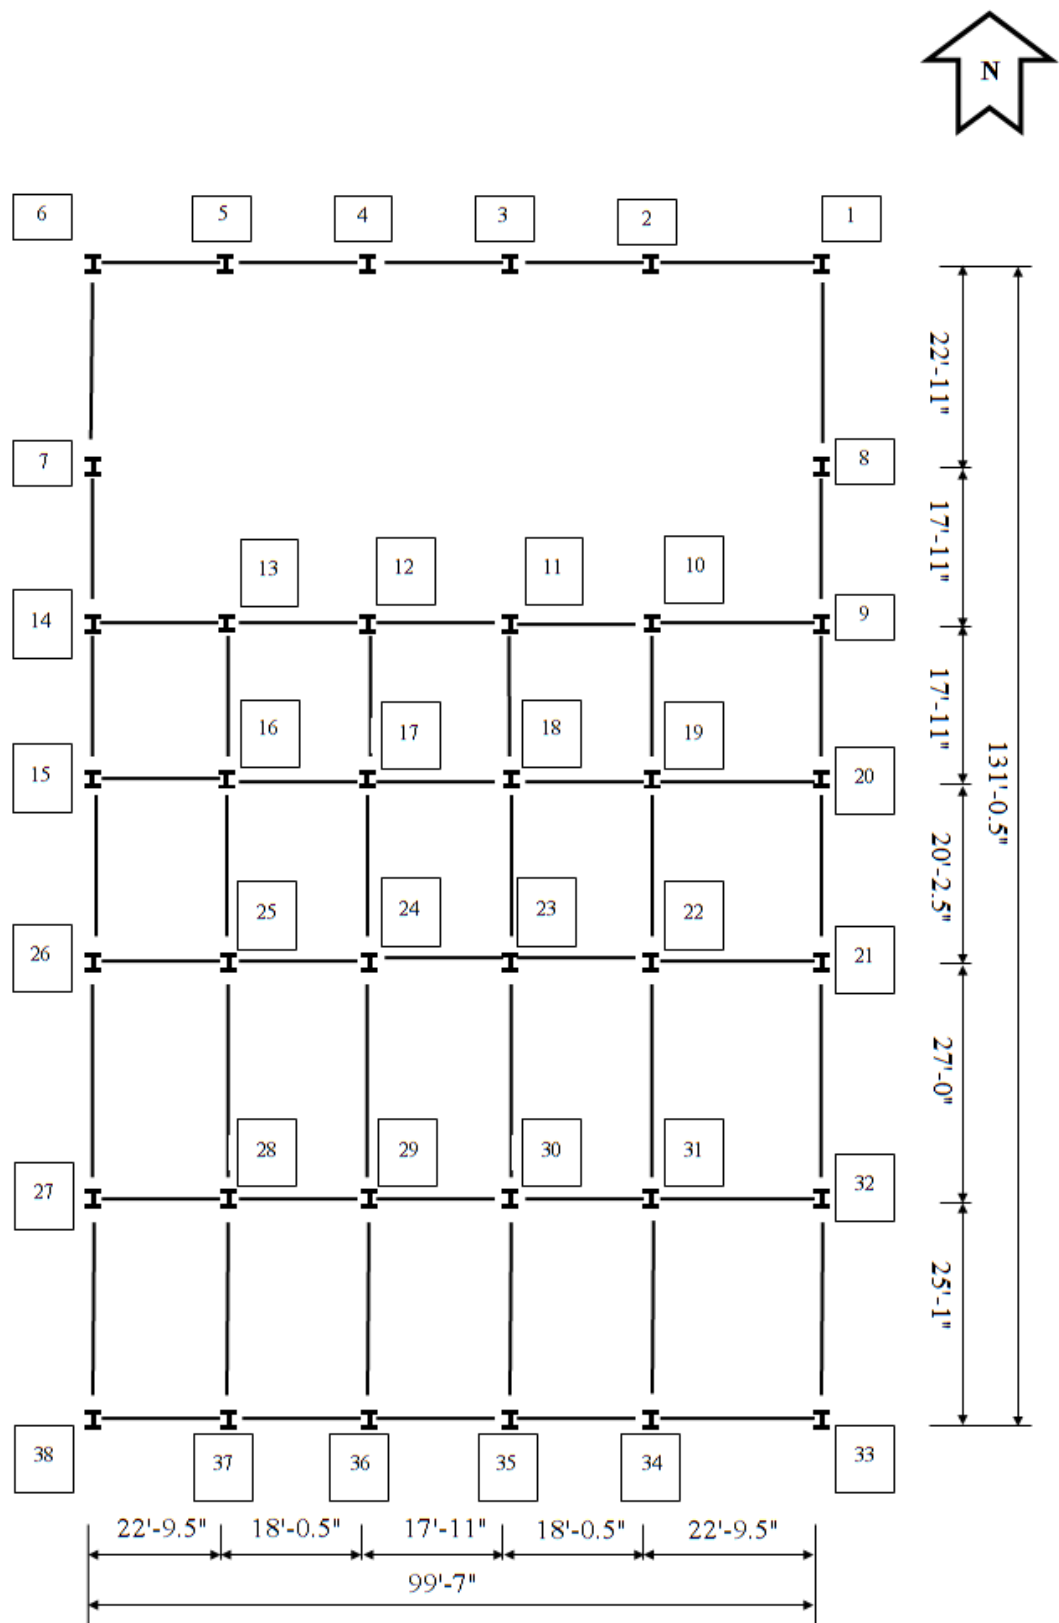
Haskett Hall floor layout (column numbers shown in rectangular boxes)
